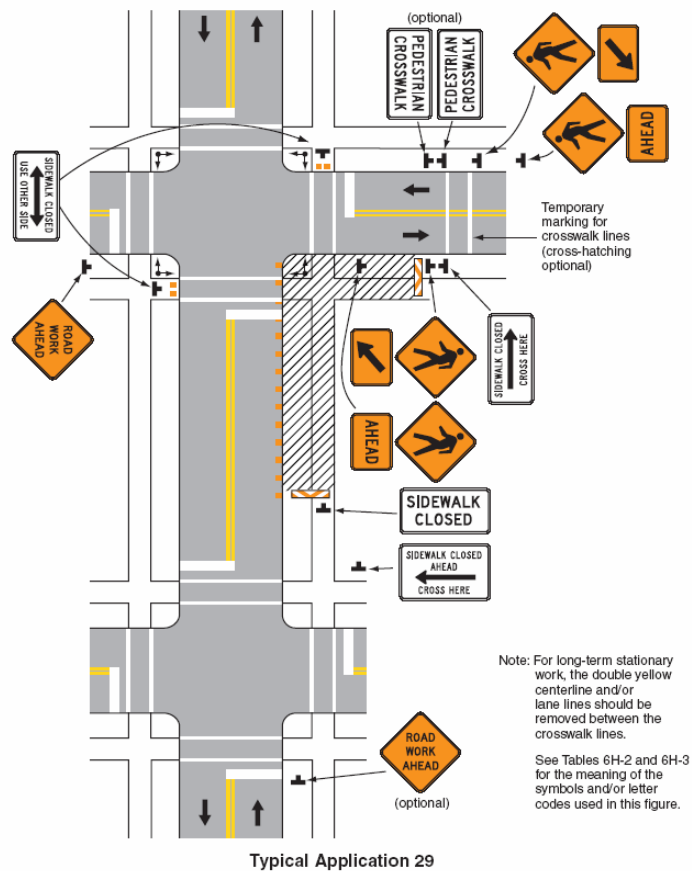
Typical application 29 - crosswalk closures and pedestrian detours (5)
